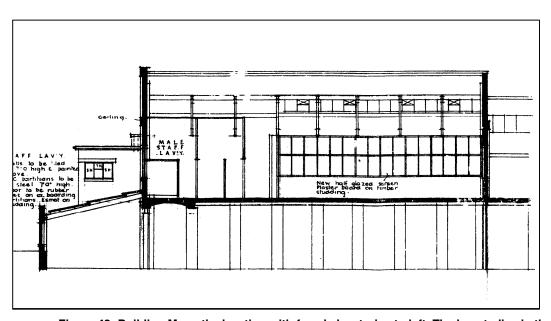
Building M south elevation with female lavatories to left. The lean-to lies in the demolished area of M. 30
